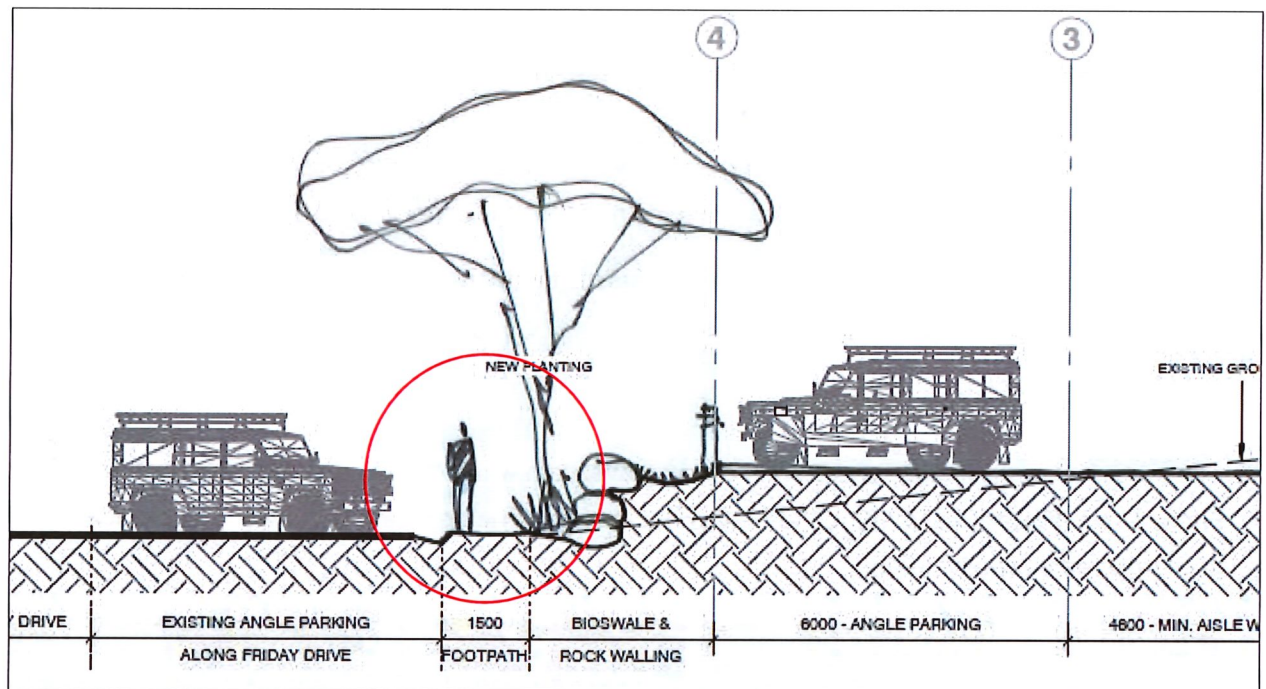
Pedestrian path adjoining existing car parking along Friday Drive and new car parking area (Source: Applicant's documentation)
